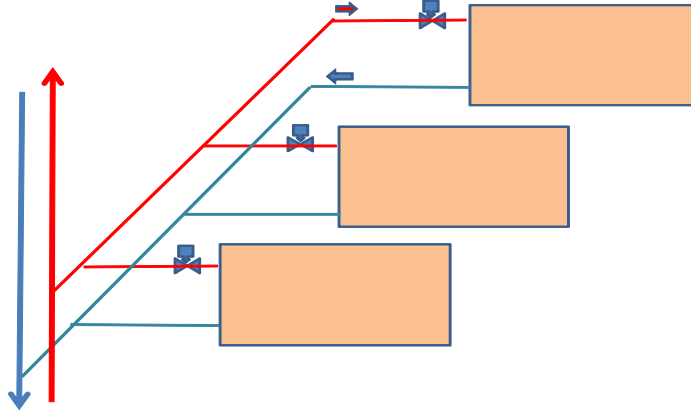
Horizontal piping of an apartment connected to the riser pipes in the staircase.
